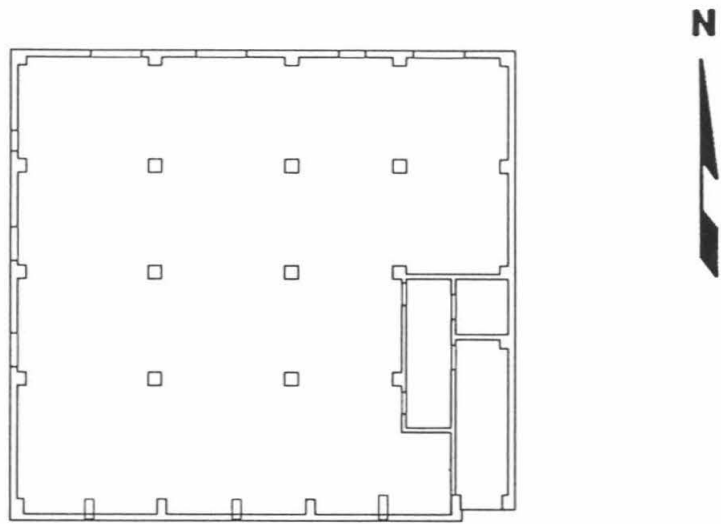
Plan View of Second Floor, Elevation 17'-10"
